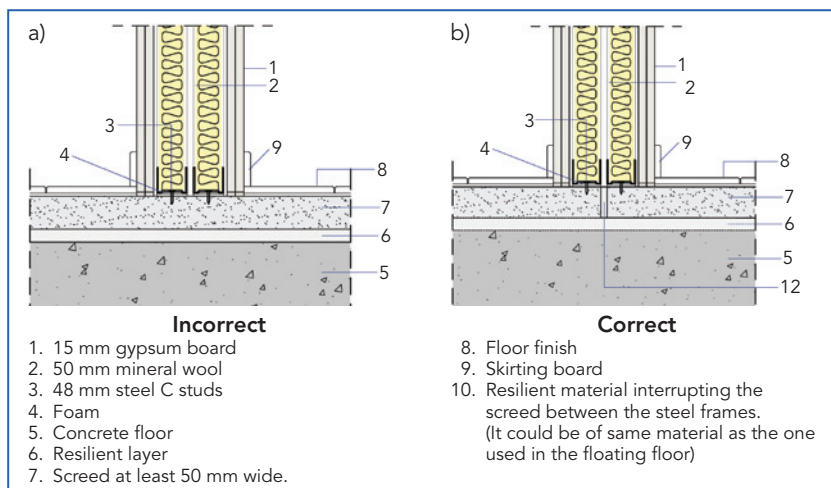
Floor junction of a steel frame wall. a) Incorrect. The floor bridges the steel frames. b) Correct junction: a joint is performed between both frames [9].
